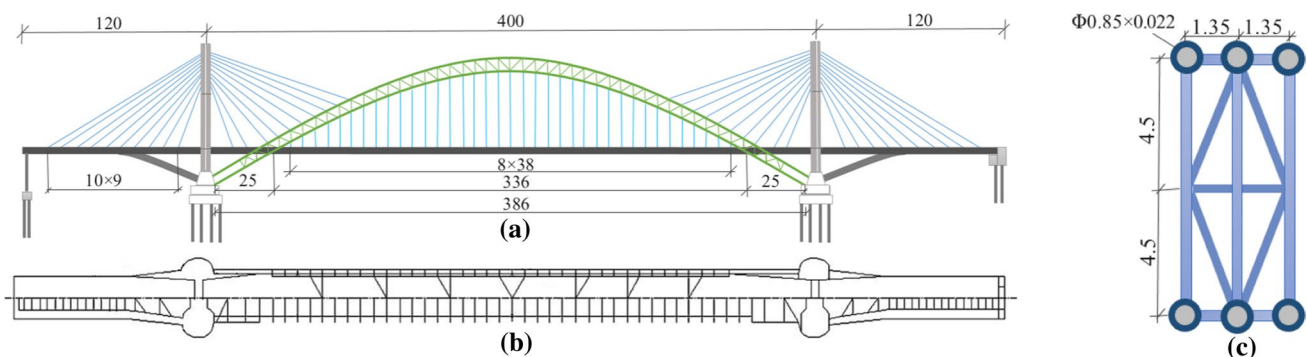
General view of the LianCheng bridge (values in meter): a elevation b plan view c cross section of main arch rib
